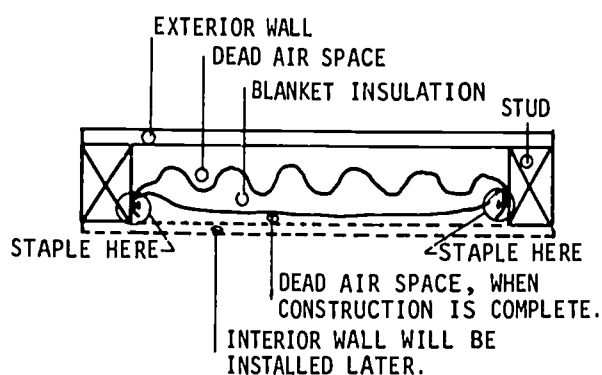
Cross Section of Wall, Showing Properly Installed Blanket Insulation
